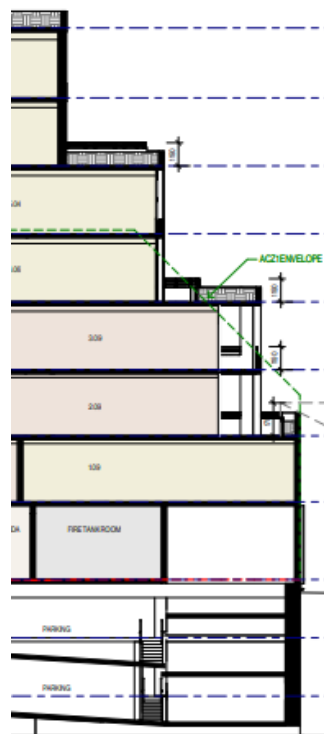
45 degree building envelope from north boundary in ACZ1 shown in green dotted line
